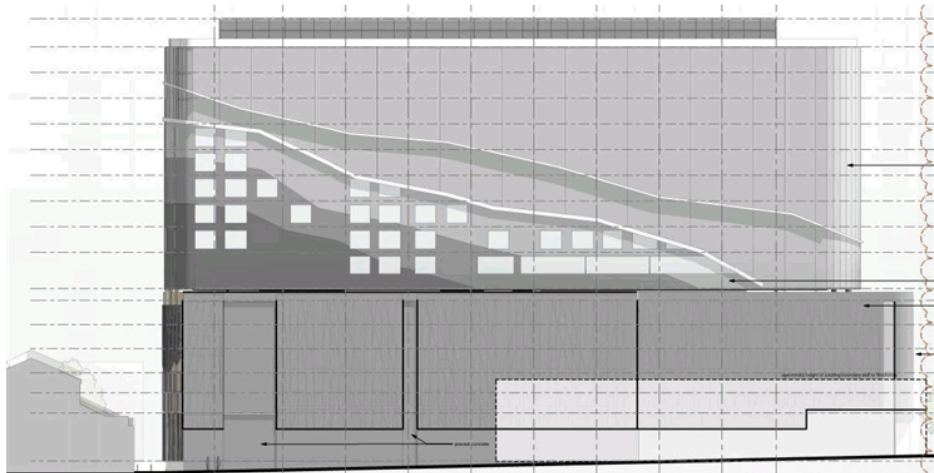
South East Elevation (from Woolstore) (Excerpt from proposal plans).
